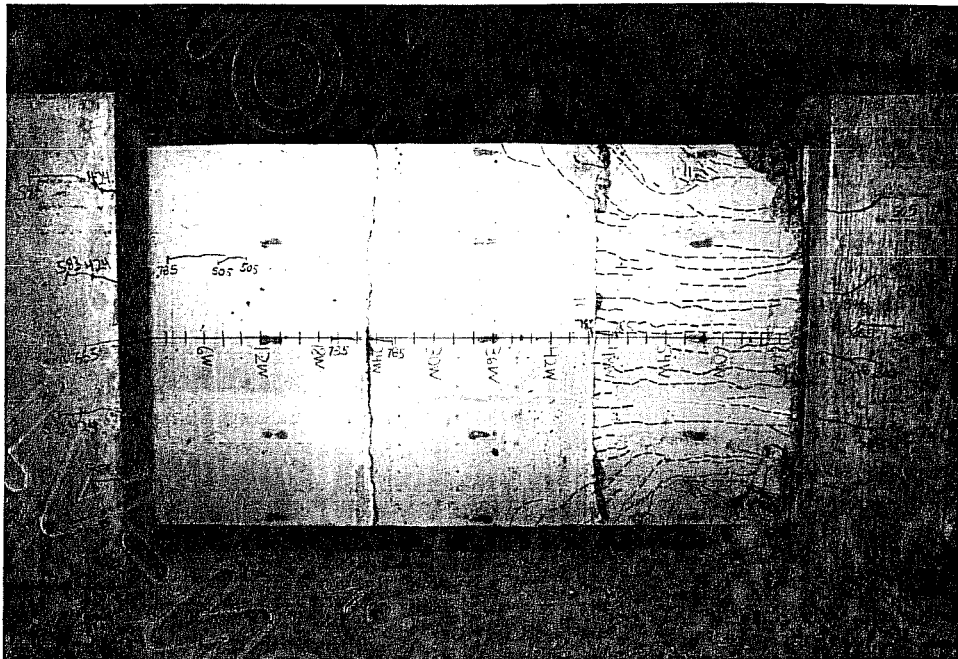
Specimen 3PM Cracks Marked after Failure
